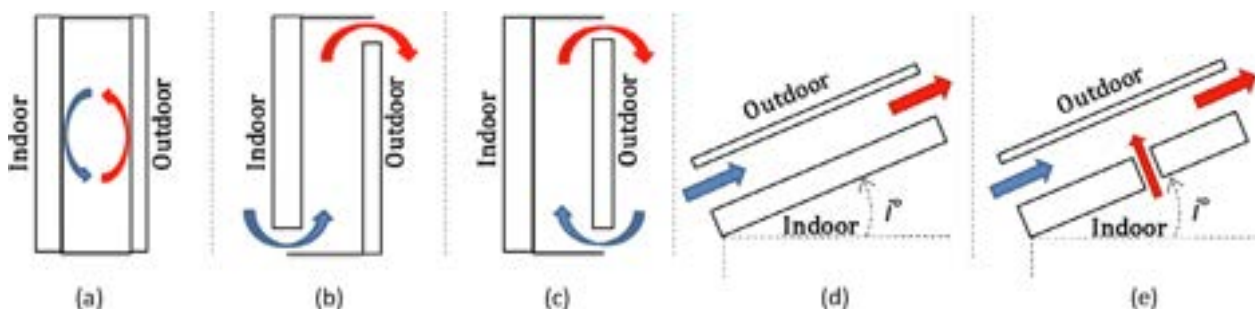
Typologies of ventilated envelope surfaces: (a) closed cavity façade; (b) exhaust air façade; (c) outdoor air curtain façade; (d) ventilated roof; (e) ventilated roof coupled to a natural ventilation of the building.
